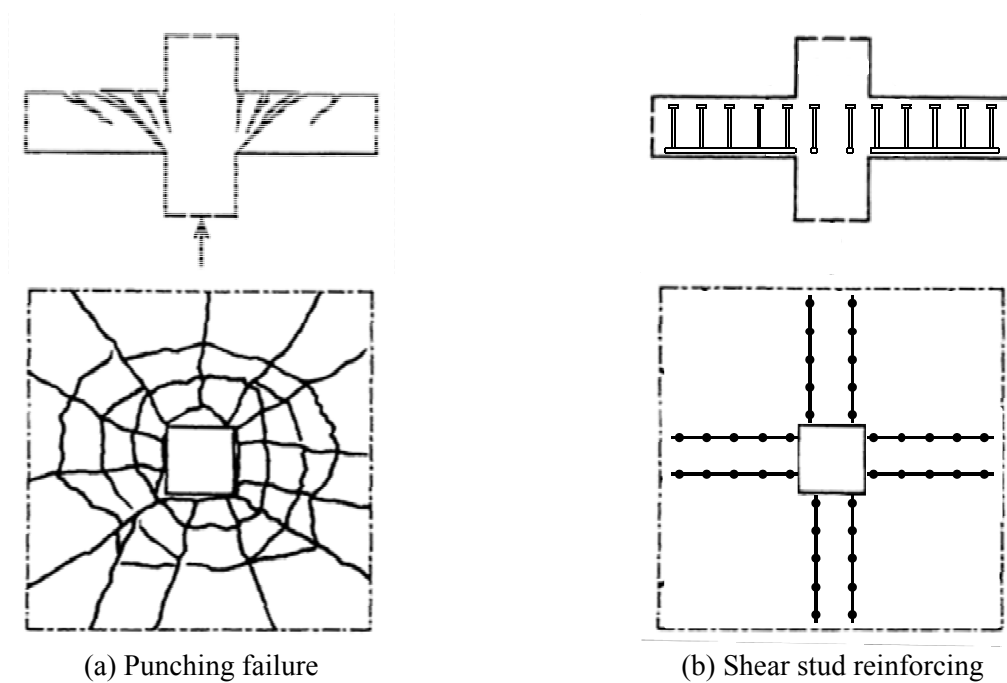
Punching failure and typically used slab shear reinforcement.(Park and Gamble, 2000)
